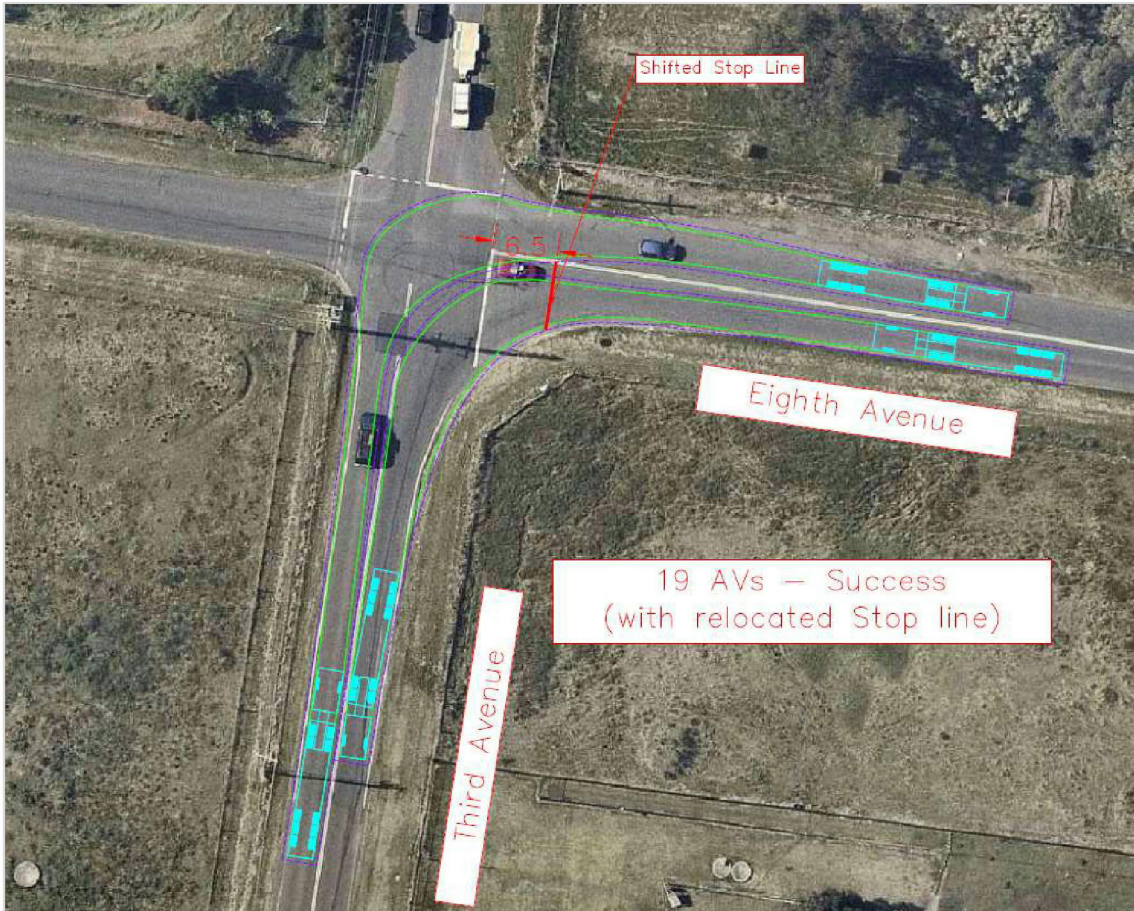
Proposed relocation of the stop line – Eighth Avenue/Third Avenue intersection (Source: McLaren Traffic Engineering)
